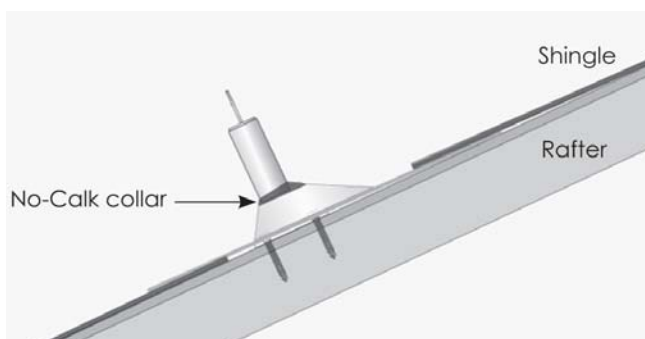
Flashing detail for a cylindrical standoff with boot flashing. (Courtesy of Uniirac)
